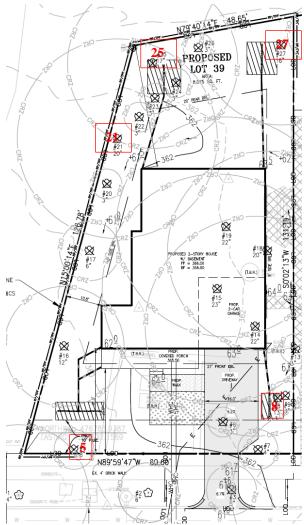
Site plan showing five trees proposed for removal outside the building envelope.
